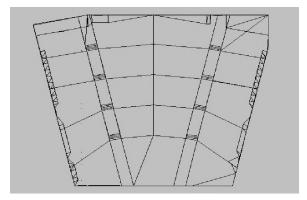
Plan view of Lecture Hall Ceiling for the Detailed Model
